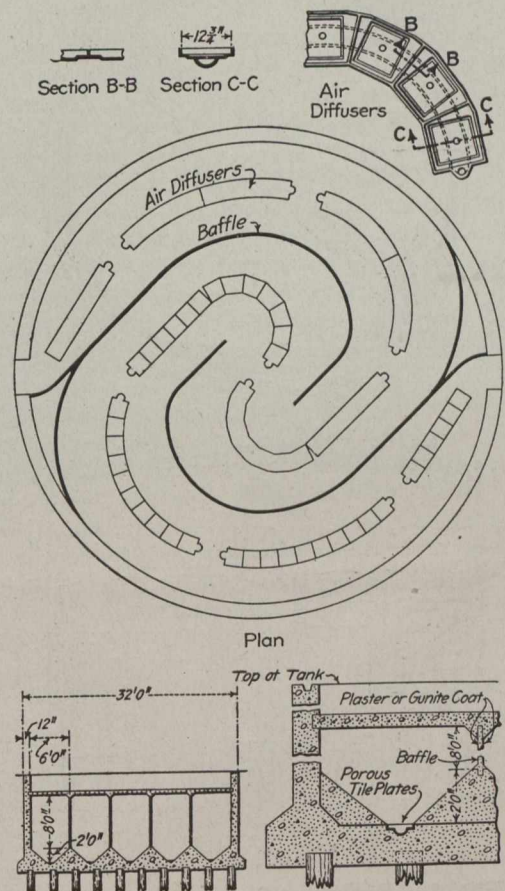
Details of Tank Bottom, Showing Arrangement of Baffles and Air Diffuser Plates
